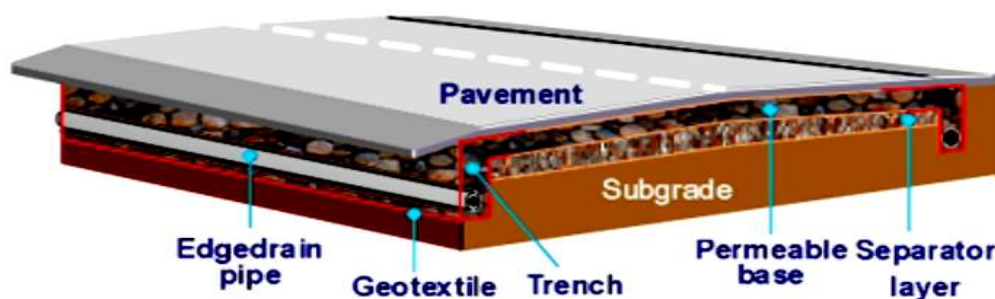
Typical asphalt pavement section with drainage layer in the DRIP program (NCHRP, 2004).
